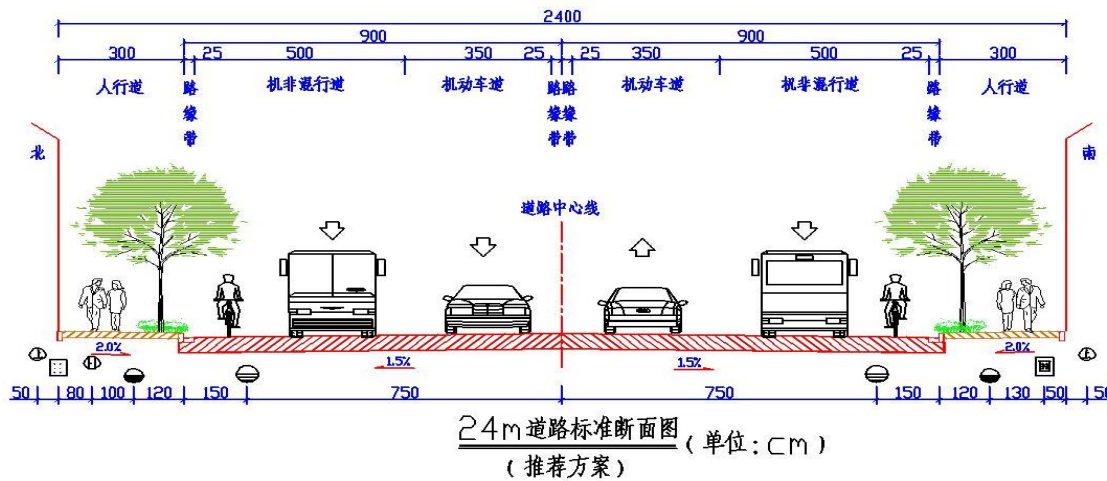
Cross-sections of No. 2 Road in Lufeng
